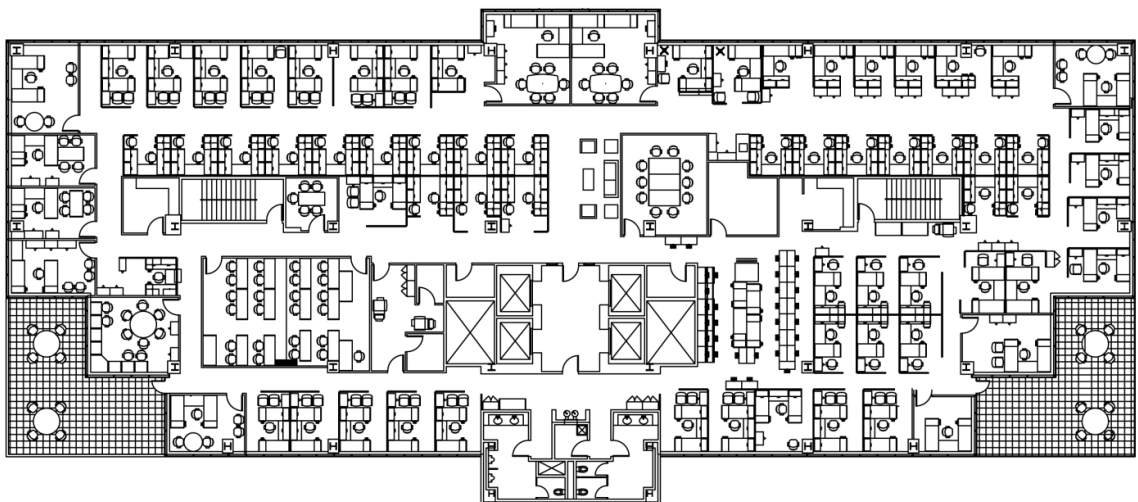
Typical floor plan. Plan has been modified to protect partner organization anonymity.
